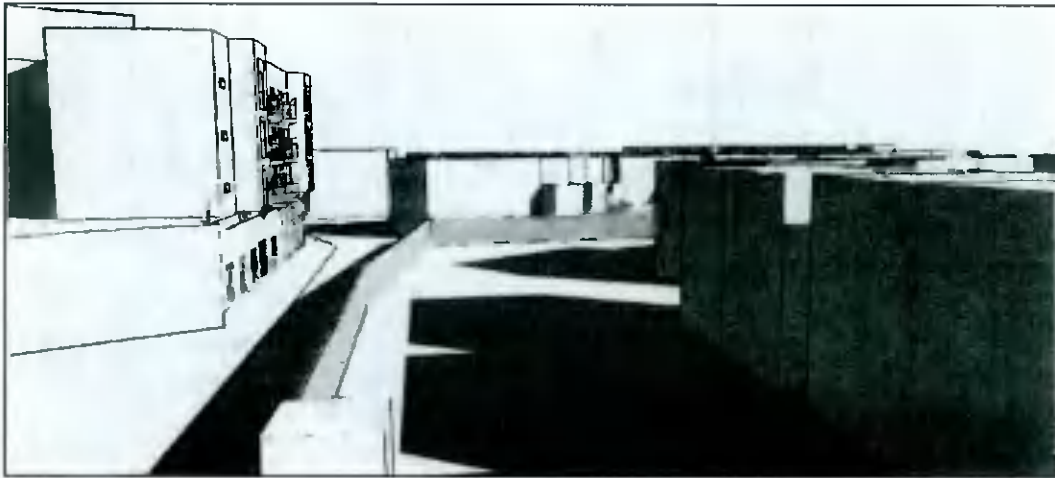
3D Study looking northeast and from laneway toward Wheatfield Road.
